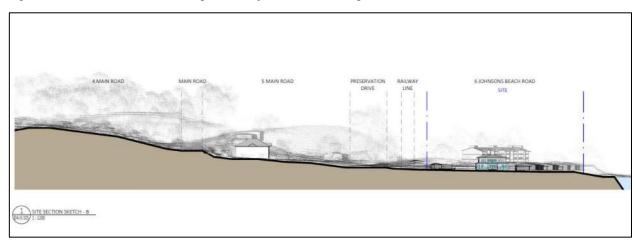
Section B - through the subject site and 5 Main Road. Buildings north of the section line are also shown for context - noting the apartment building is located approximately 92m north-west of the point in which the section is drawn.
